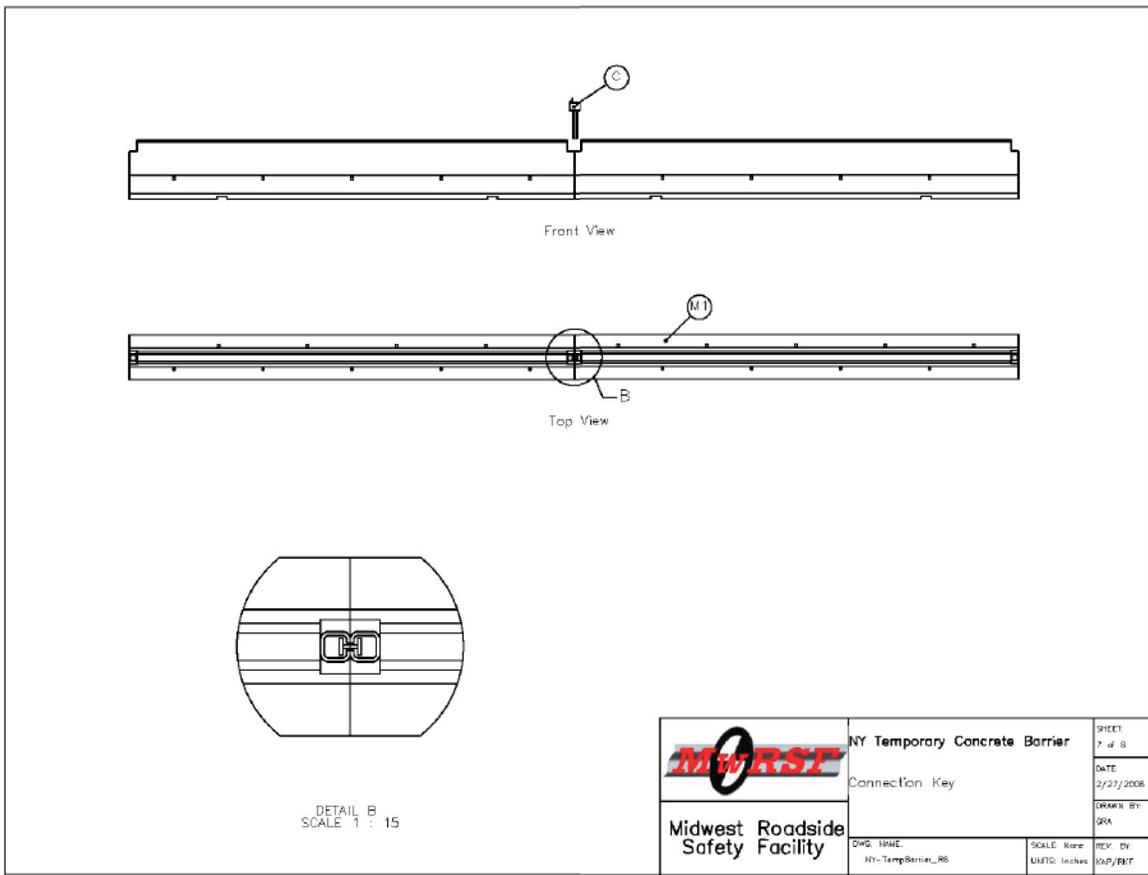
Temporary Concrete Barrier Connection Details (English), Test NYTCB-2
